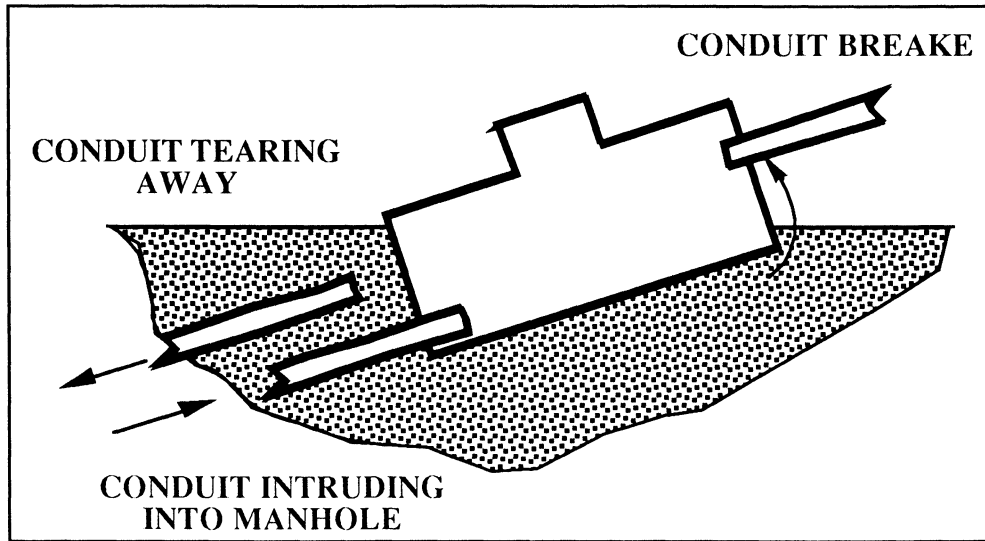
Damage to conduit when a manhole floats to the surface when surrounding soil liquefies.
